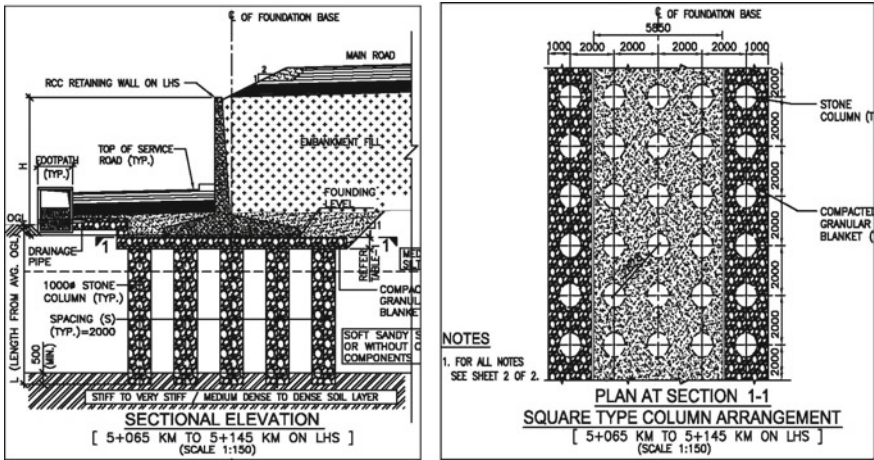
Typical elevation and plan showing arrangement of stone columns and granular blanket below retaining wall
